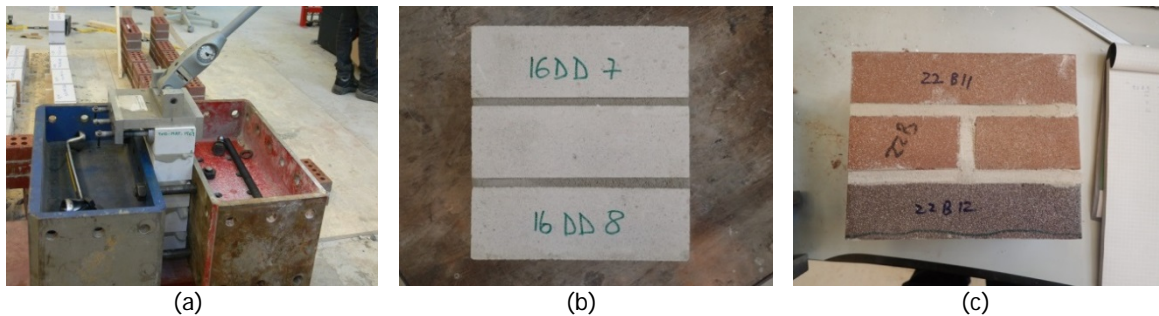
Specimens for bond wrench test: (a) five stack bonded bricks specimen; (b) three stack bonded bricks specimen; (c) sawn cut specimen.
